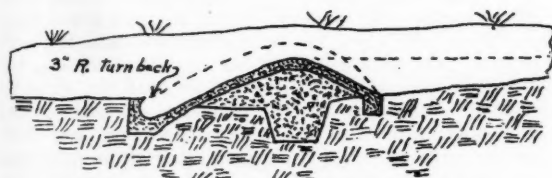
SECTION VIEW OF CONCRETE ROAD DITCH CHECK
